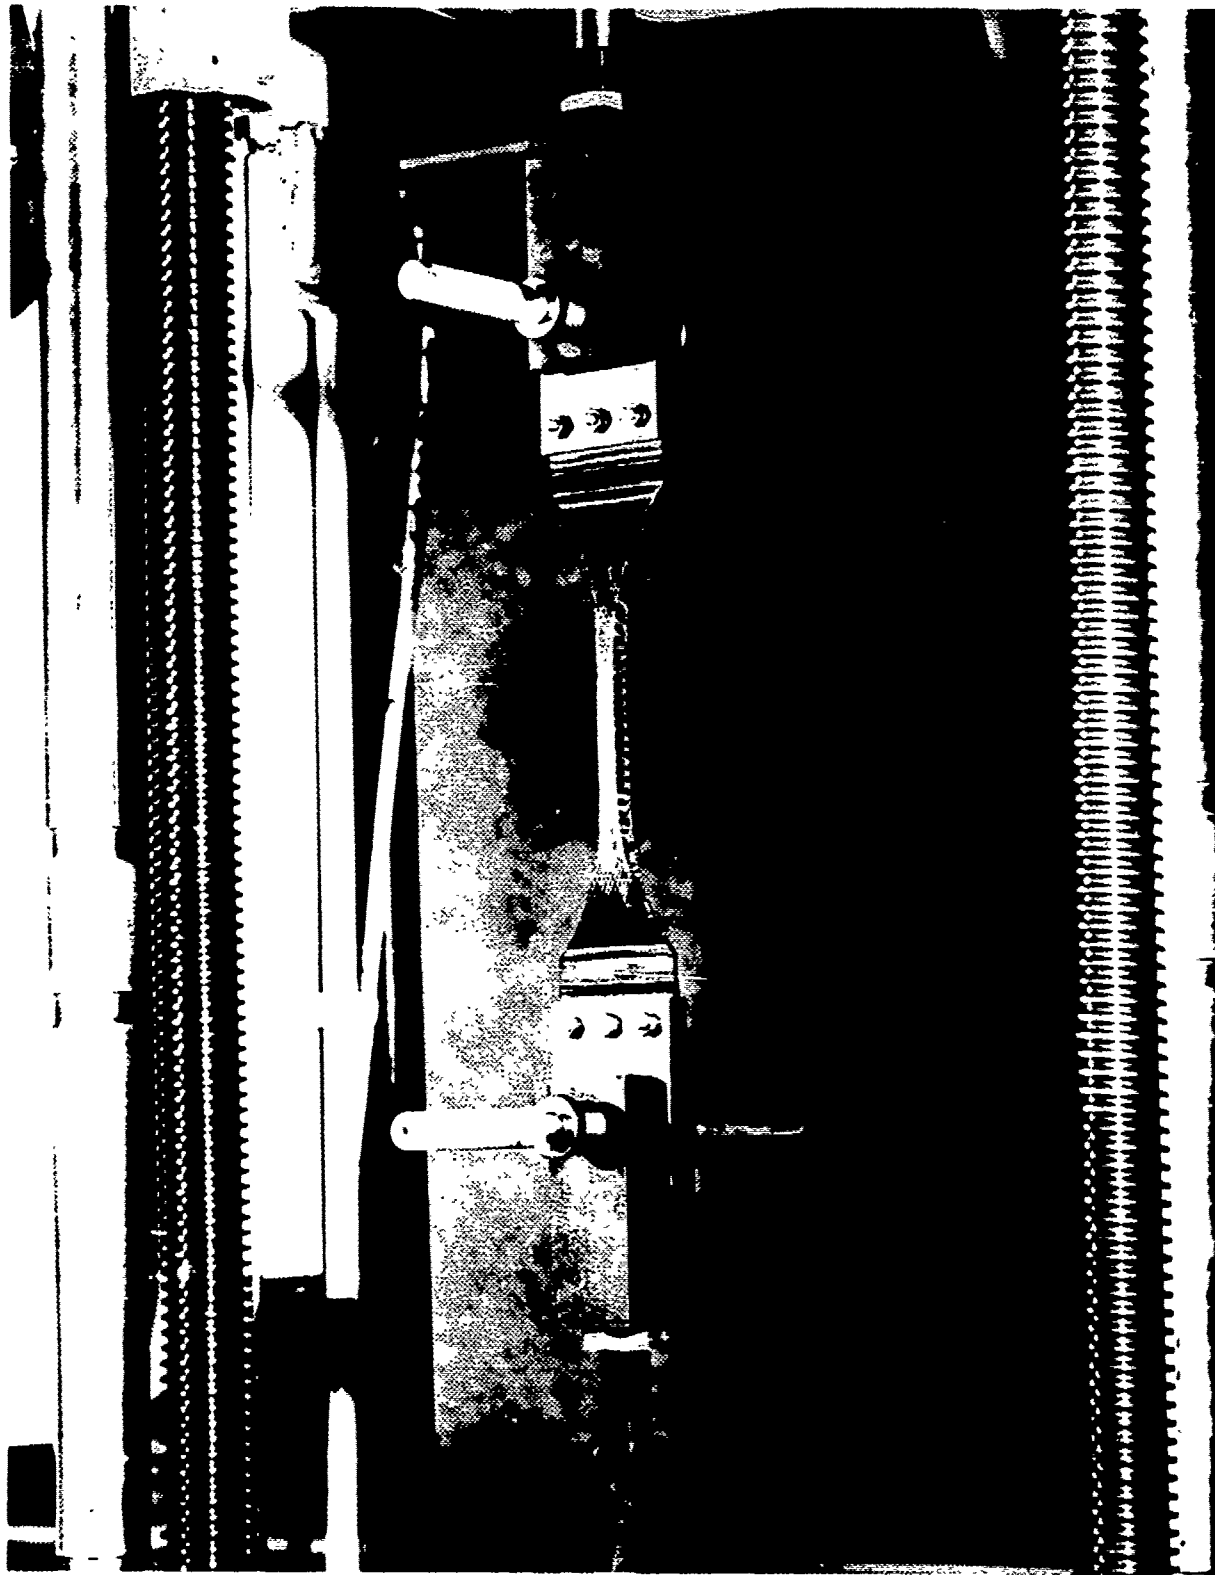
CUTOUT TRUSS WEB ELEMENT TENSION TEST SETUP
